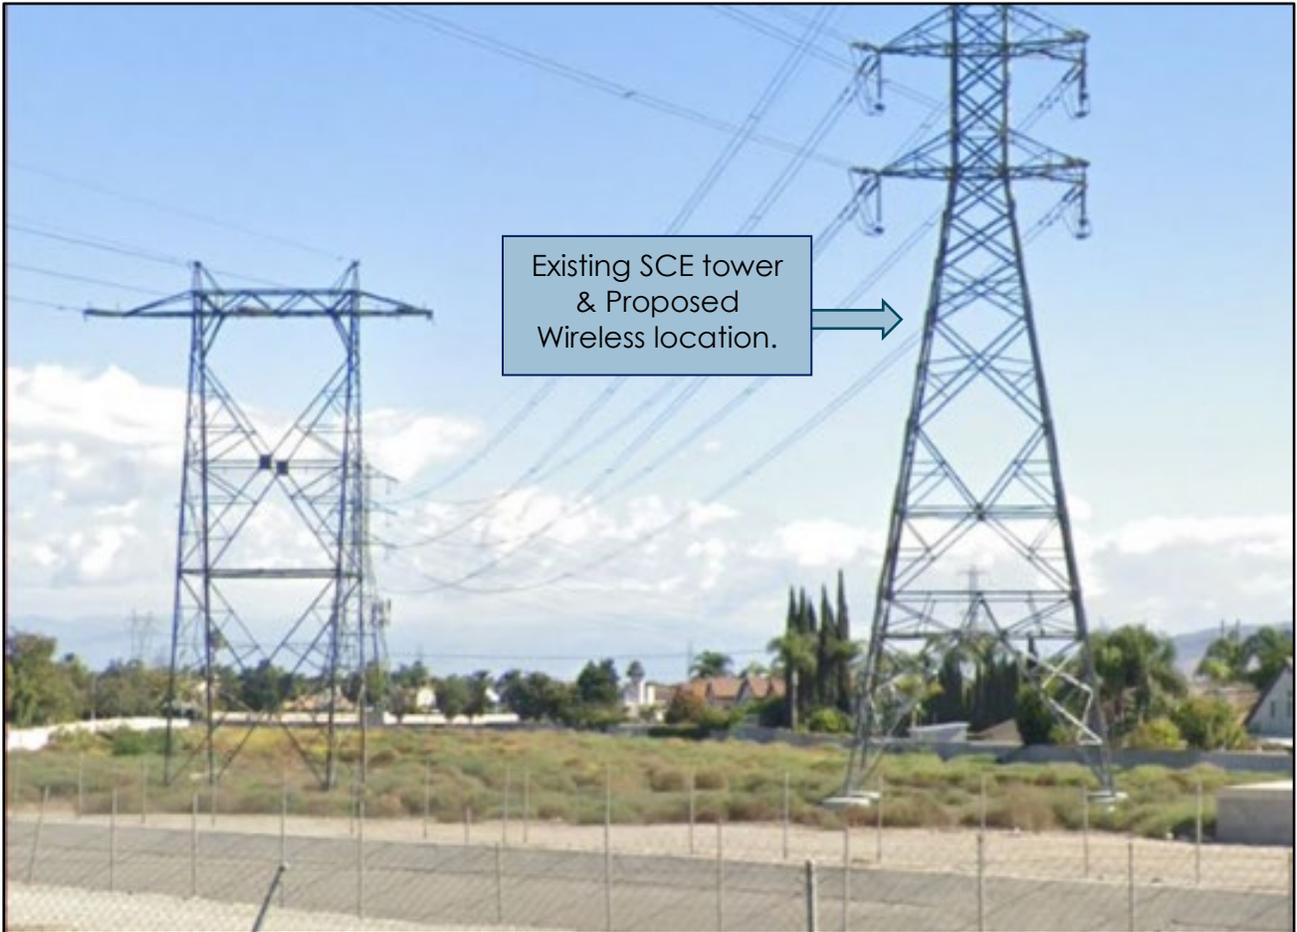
Exhibit E: SITE PHOTO - VIEW FROM OLD ARCHILABLD RANCH ROAD
